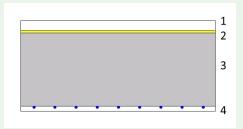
Active Ceiling/Floor construction: 1 Flooring, 2 Polyurethane foam board, 3 Heavy mix concrete, 4 Gypsum plaster with capillary mats.
